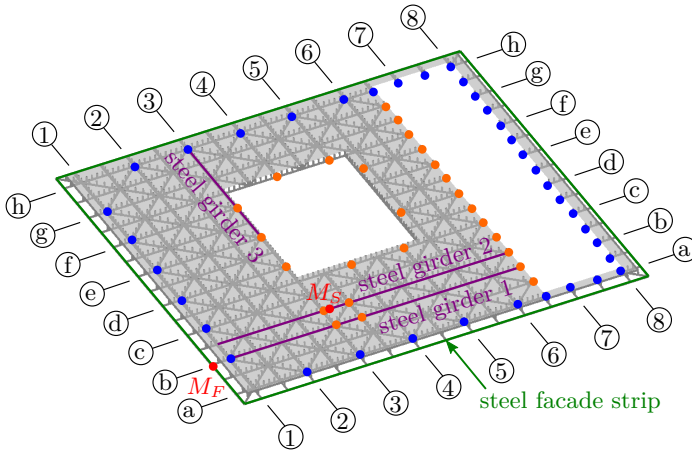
Roof construction: covered girder grid made of wood with highlighted important construction members and supports (blue and orange points). Refer to Appendix A.4 for more details. Adapted from Fußeder et al. [67].
